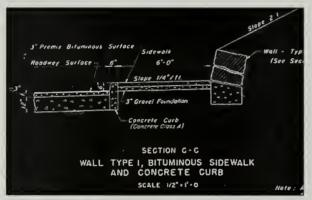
Detail of paved walkways with curbs at the Sand Beach parking area. (U.S. Department of Commerce, Bureau of Public Roads, Project 43A1, Sheet 6 of 23, February 1953)
